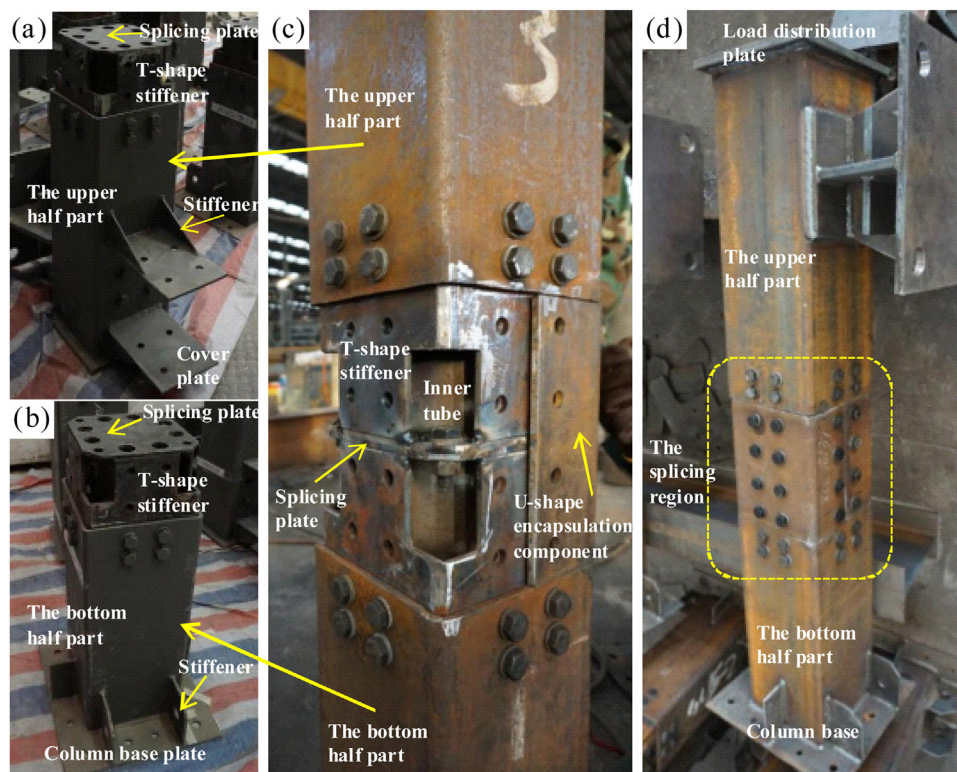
Splicing-type column-to-column joint (a. the upper half part; b. the bottom half part; c. details of column-to-column connection; d. the connected CFDST column).
